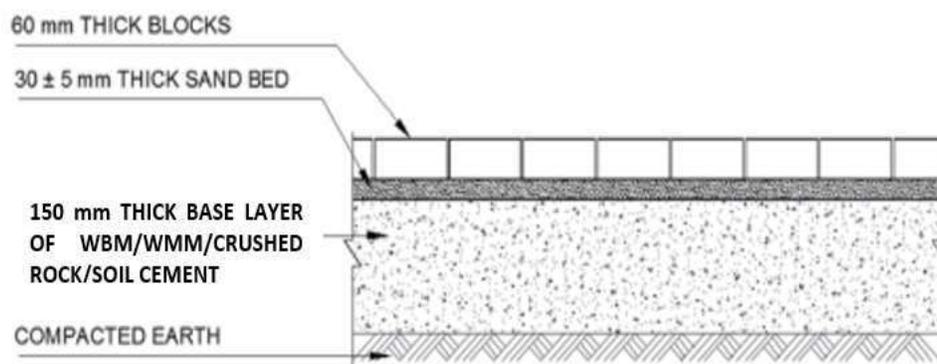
Typical Cross Section of Block Pavement used in Sidewalks /Footpaths/Car-parks /Cycle Tracks
